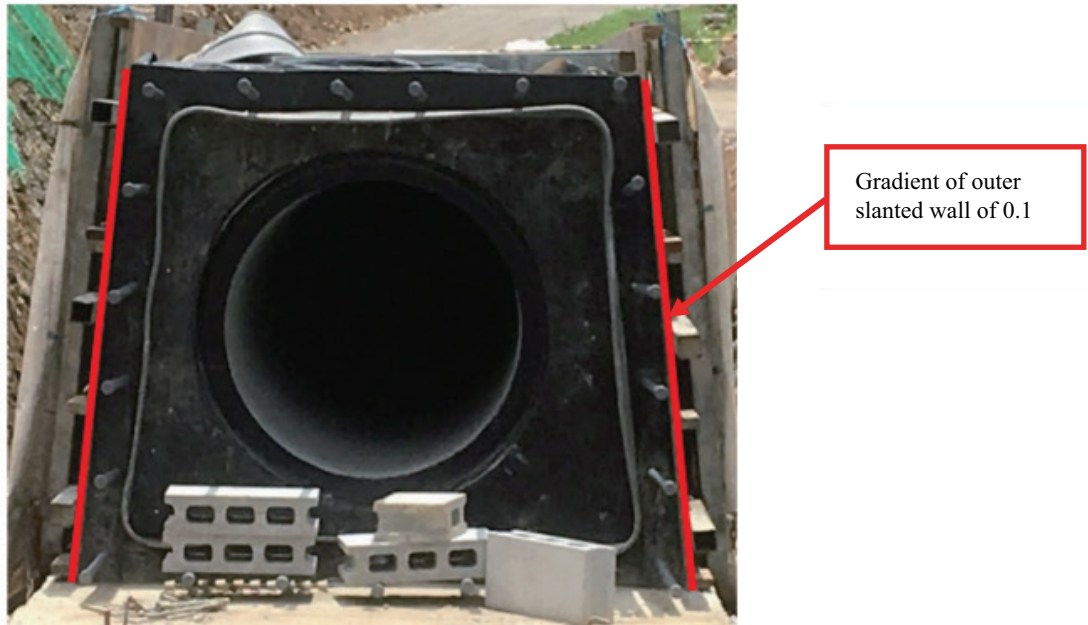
Current general shape of a groundwater dam culvert in Japan with sloping outer walls with a slope of 0.1
